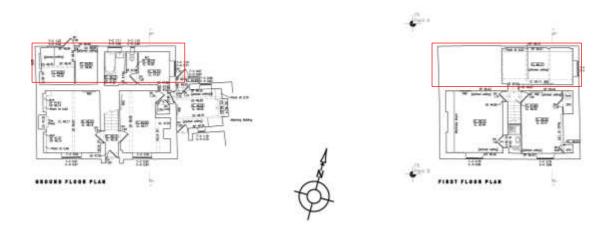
Ground and first-floor plans with rear extension Plan supplied by client. Extension outlined in red. See later for detailed plans
